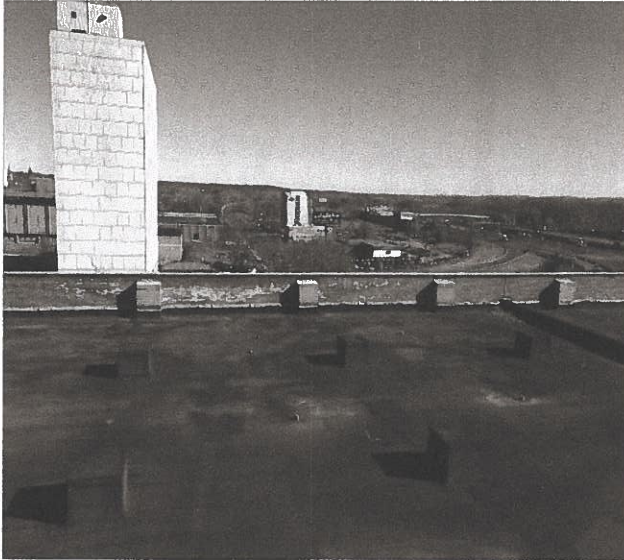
Minor ponding on garage roofing system. Note the lack of drainage on the Northwest side of roof.
